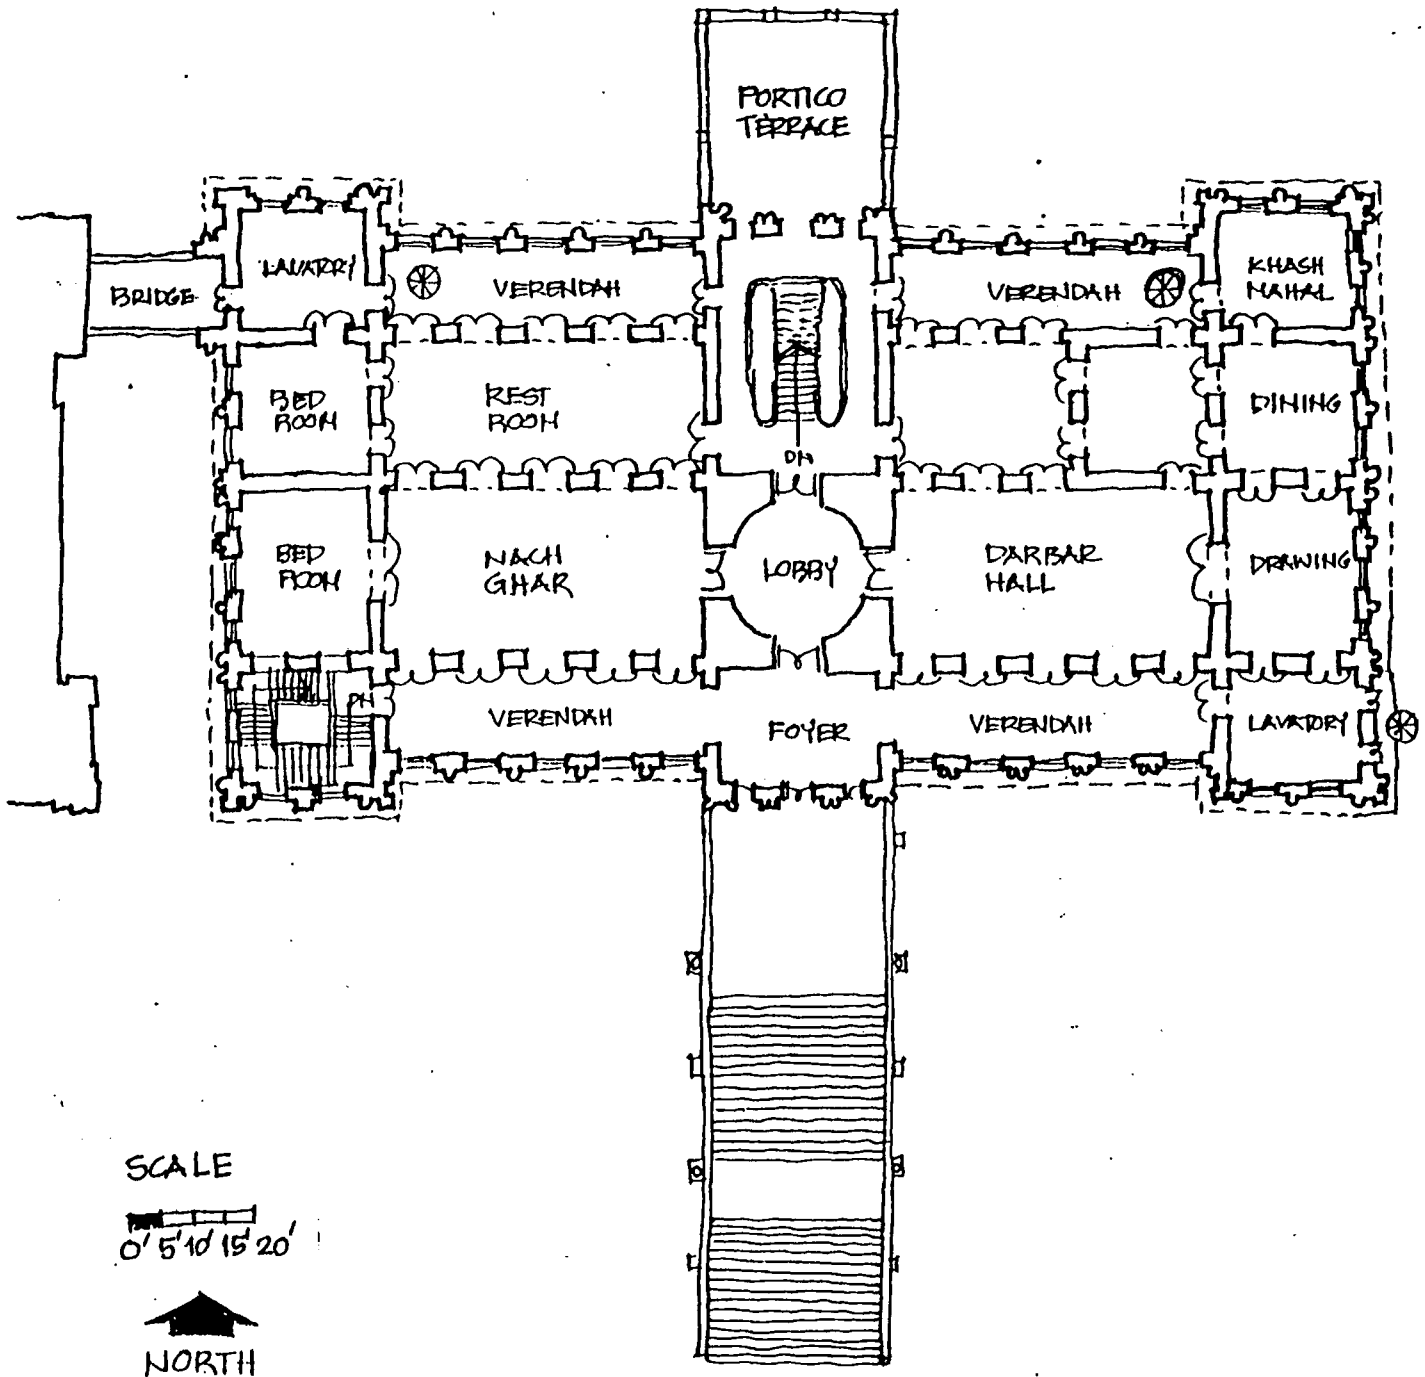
First floor plan, Ahsan manjil Dhaka
